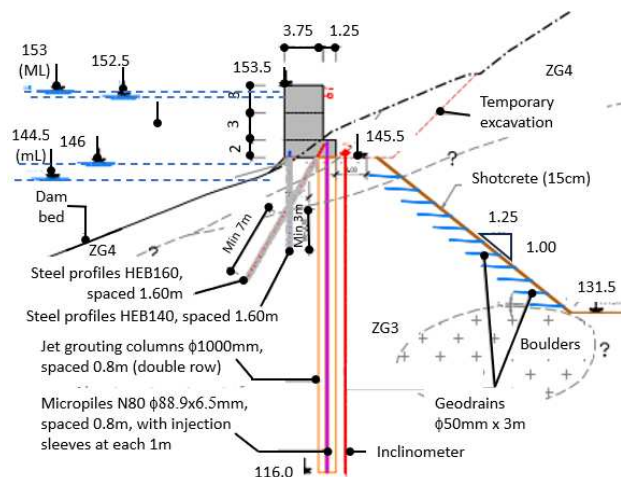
Cofferdam cross section 6-6 (ZG3 intersection).
